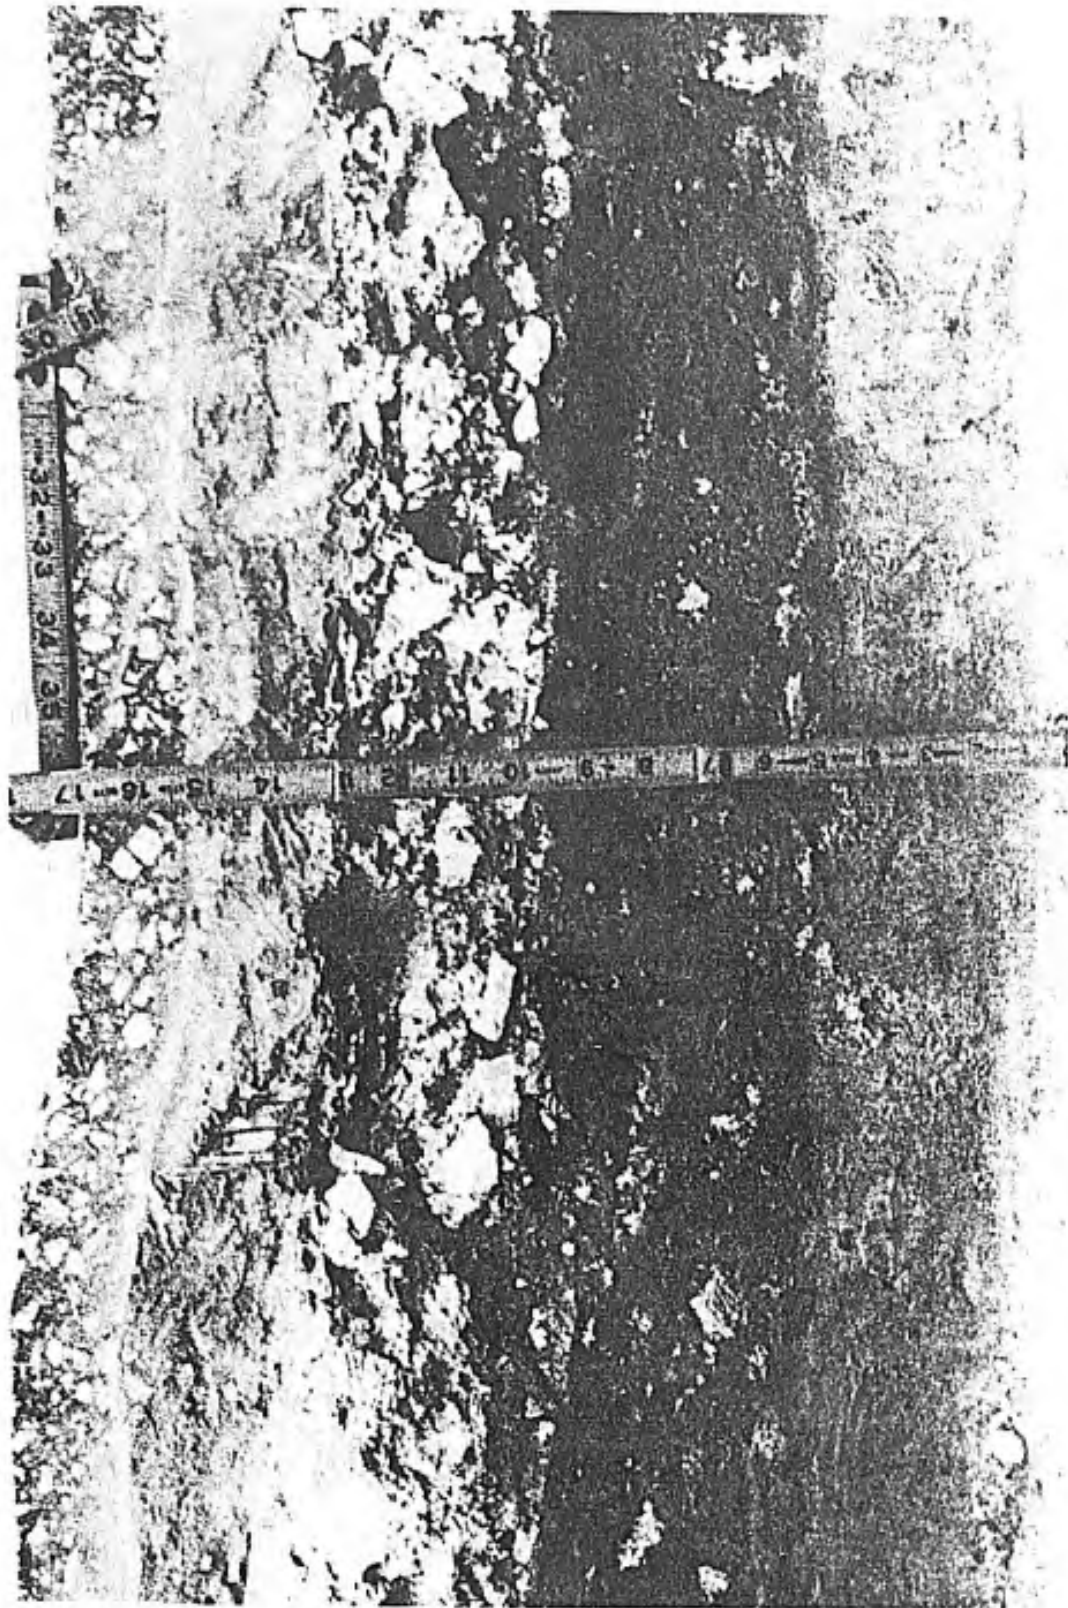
CBR Pit (Test Trench) in the F-15 Traffic Lane after 38 Coverages.
